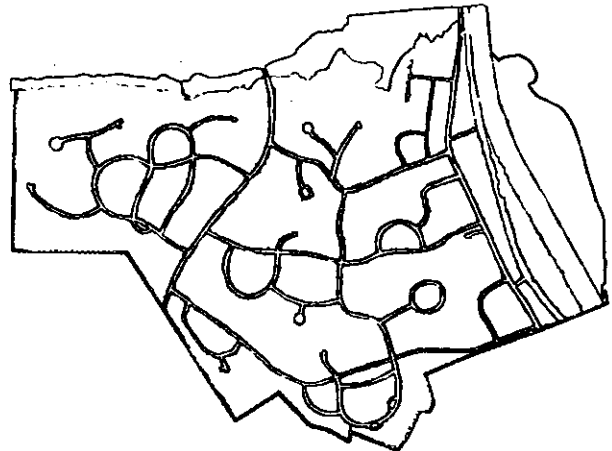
Roads planned as a system providing access to and from individual locations from more than one direction and main artery.
